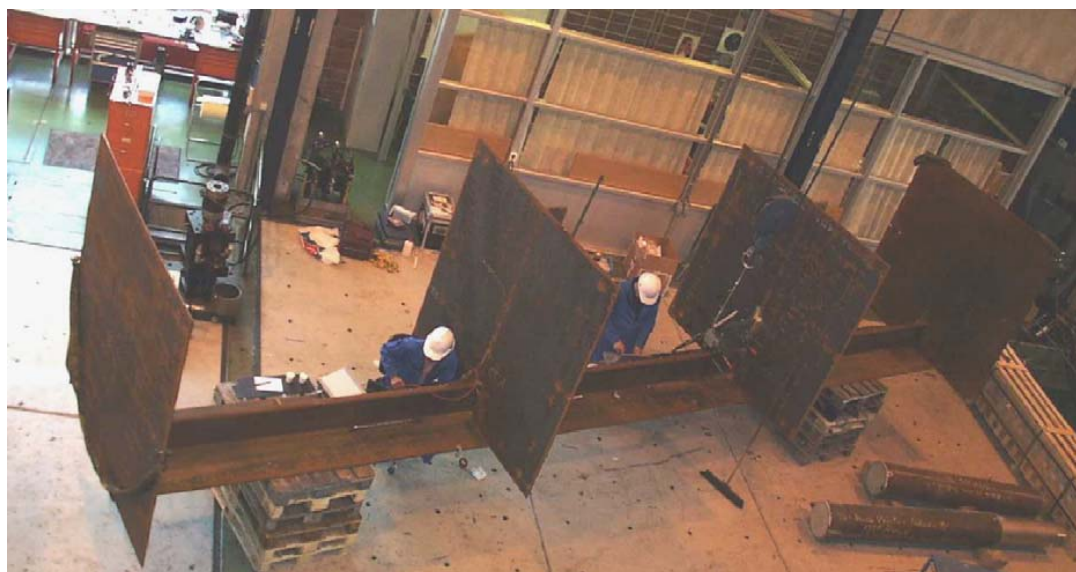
Full-scale test specimen (Lotsberg, I. and Einar L 2004)
